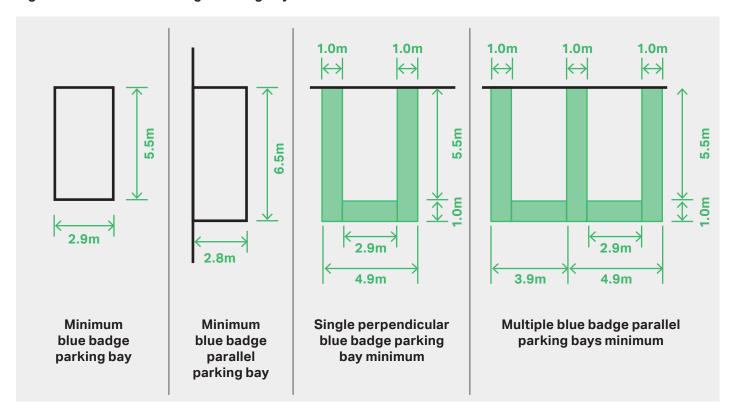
Minimum Blue Badge Parking Bay Dimensions
